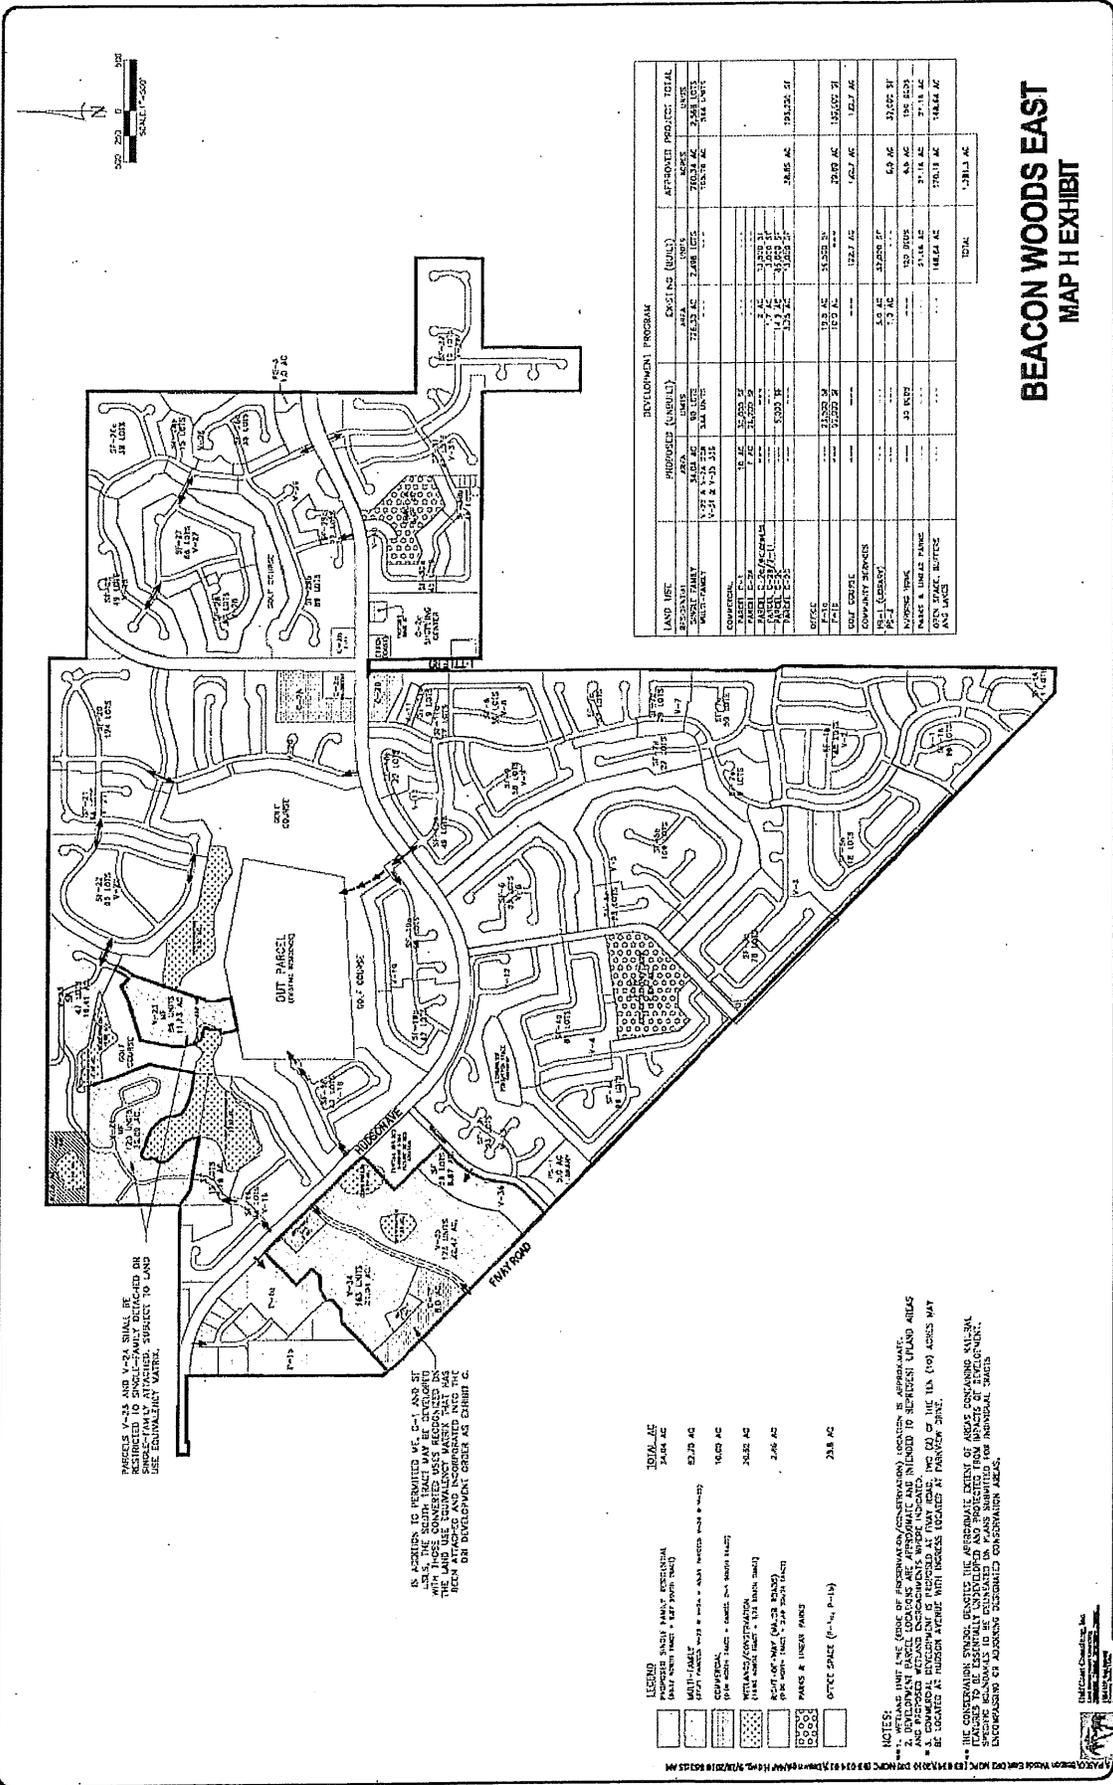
PROPOSED/REVISED MASTER DEVELOPMENT PLAN (MAP H)
